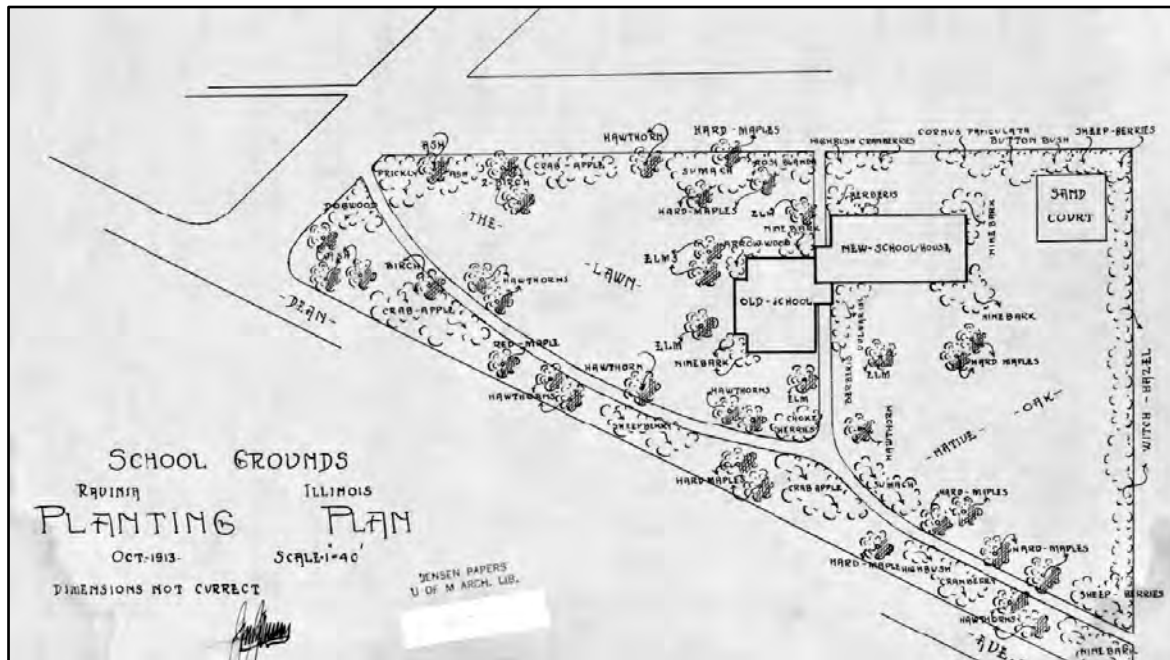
Site Plan from Jens Jensen from 1913. From Bentley Historical Library, University of Michigan.
